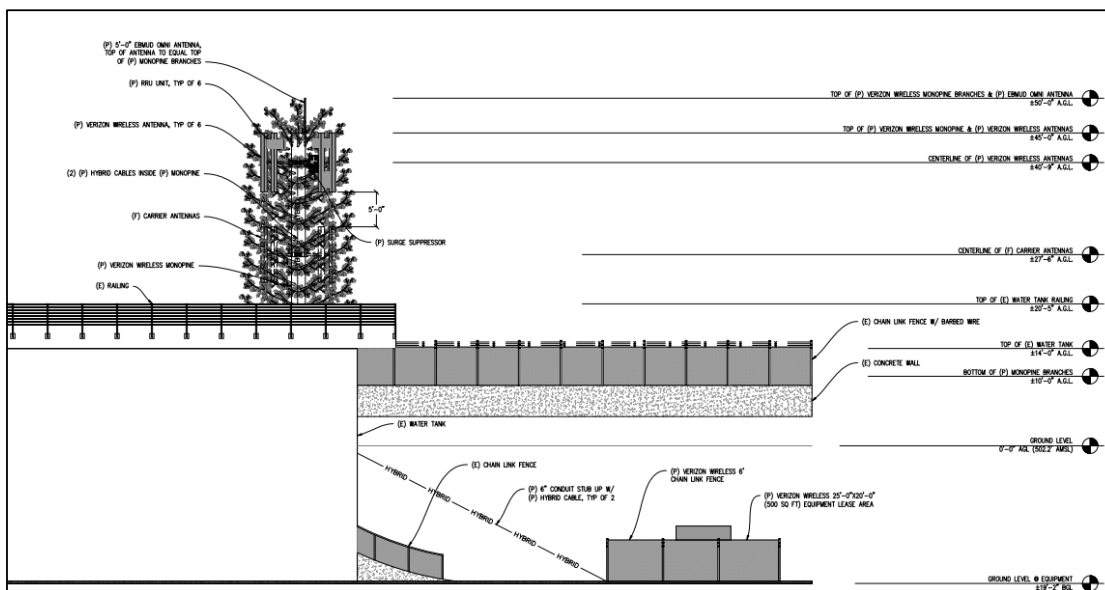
South elevations of panel antennas (Source: Plans, Page A-6).
